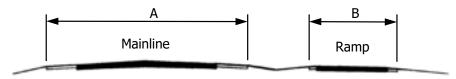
Approach roadway cross-section view for a mainline and a ramp that are carried across separate bridges.
